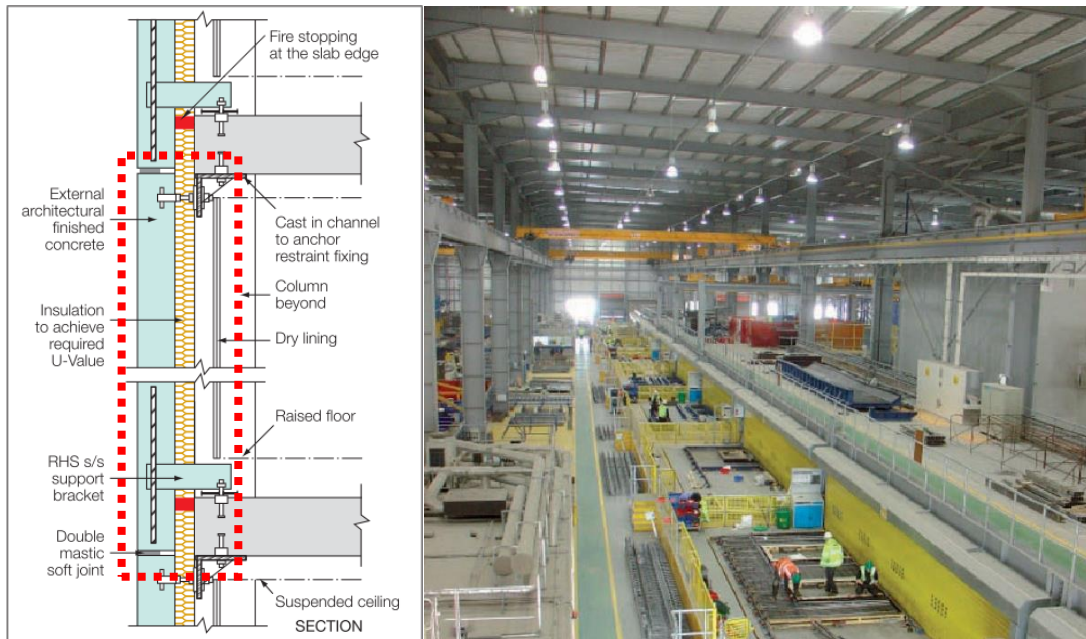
Vertical section of a precast single-skin concrete panel (left) and the “bespoke carousel” production line for concrete façade panels at the Laing O’Rourke’s Explore Industrial Park (EIP), Steetley, UK (right). Photo by courtesy of Laing O’Rourke plc.
